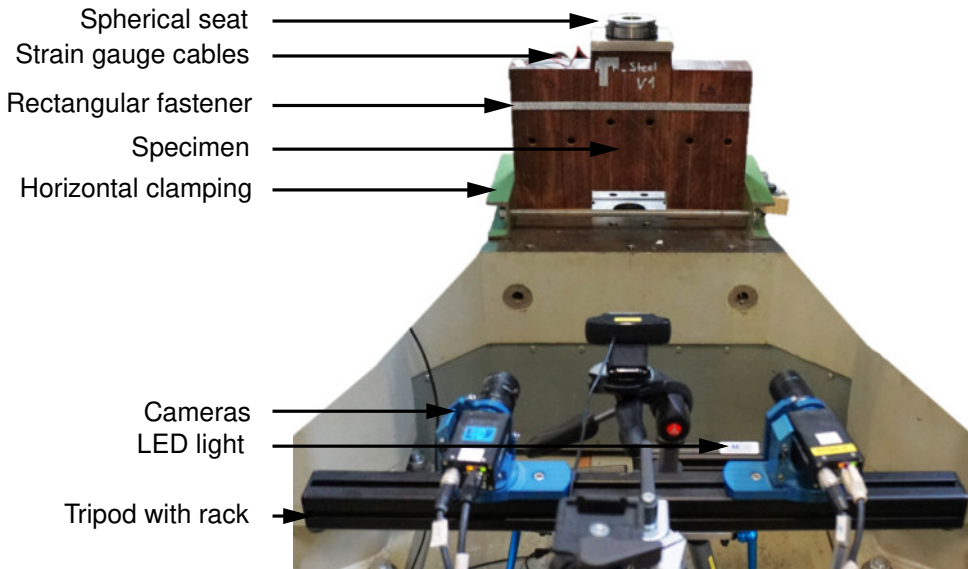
Exemplary test setup of a timber-to-timber connection. Measuring cameras in the front, specimen with calotte and horizontal clamping on the bottom in the back.
